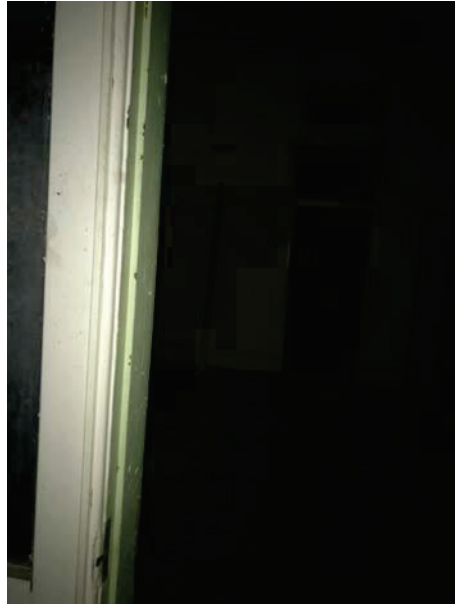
White paint on the door frame of the 2nd floor right front classroom
